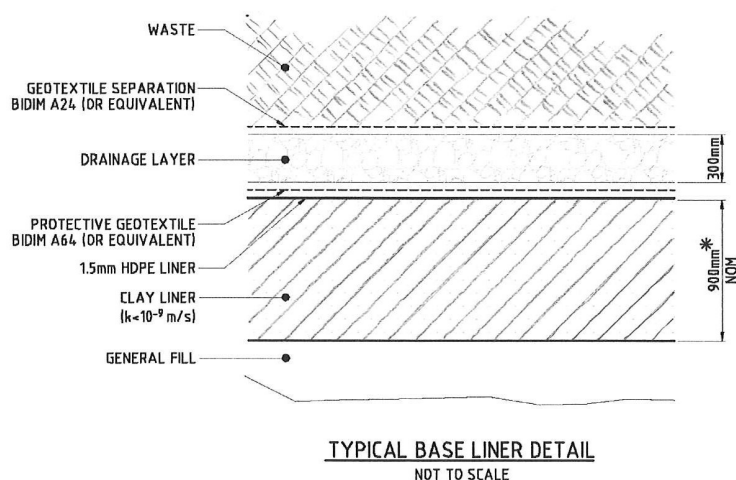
Cross section of a typical leachate barrier. Note the HDPE liner is comparatively thin and must be installed carefully.
